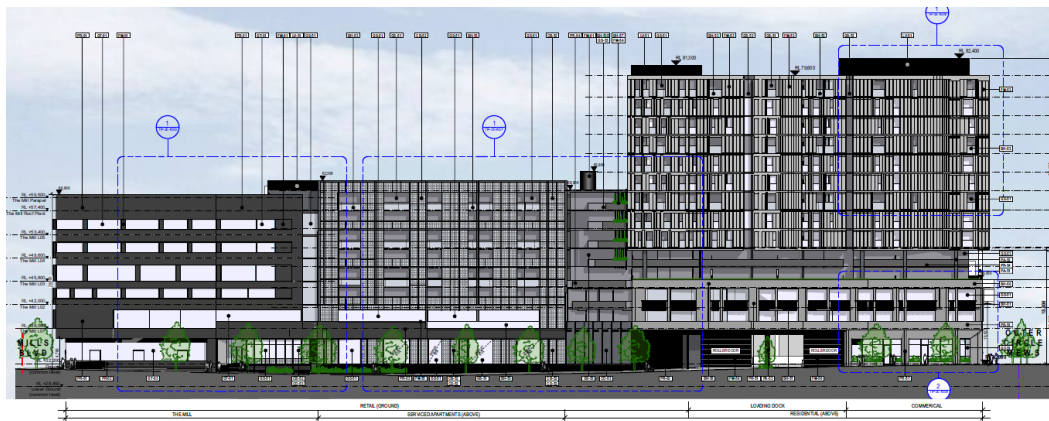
Previous approved amendment Heidelberg Road (north) elevation
